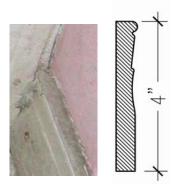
Photo and profile of Base Type 4. (Photo: BBB, 2007)
